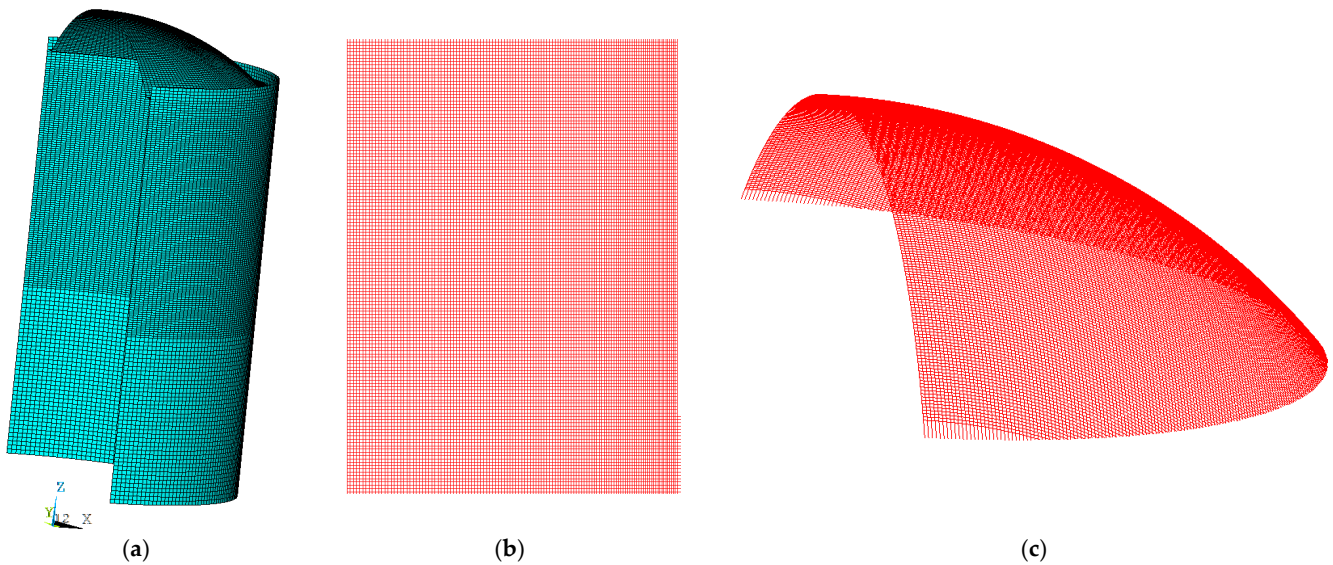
Finite element model of half SC containment. (a) Steel plate; (b) Rebar of cylinder; (c) Rebar of dome.
